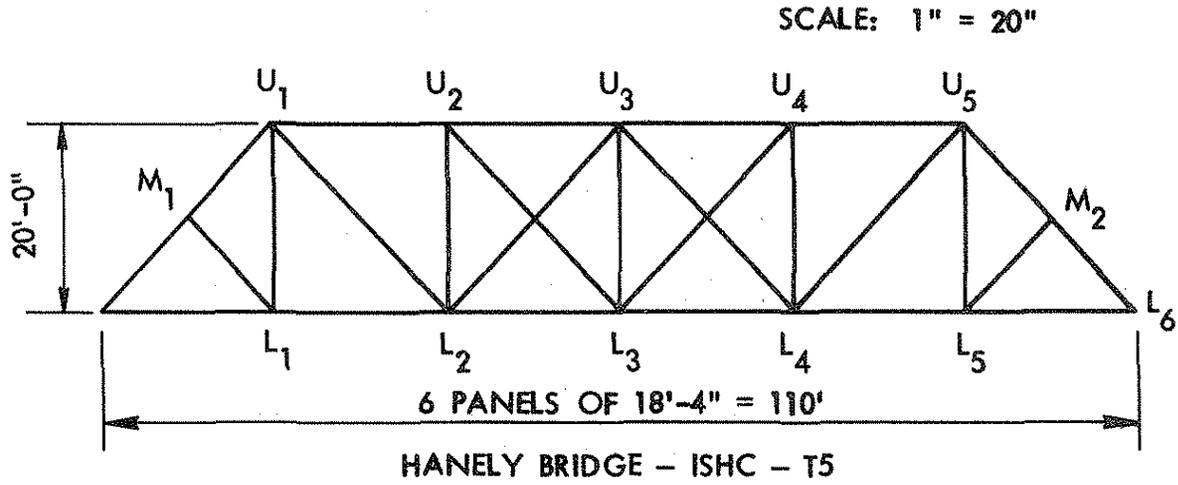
Details of Hanley Bridge (Polk County) - ISHC-T5 span.
